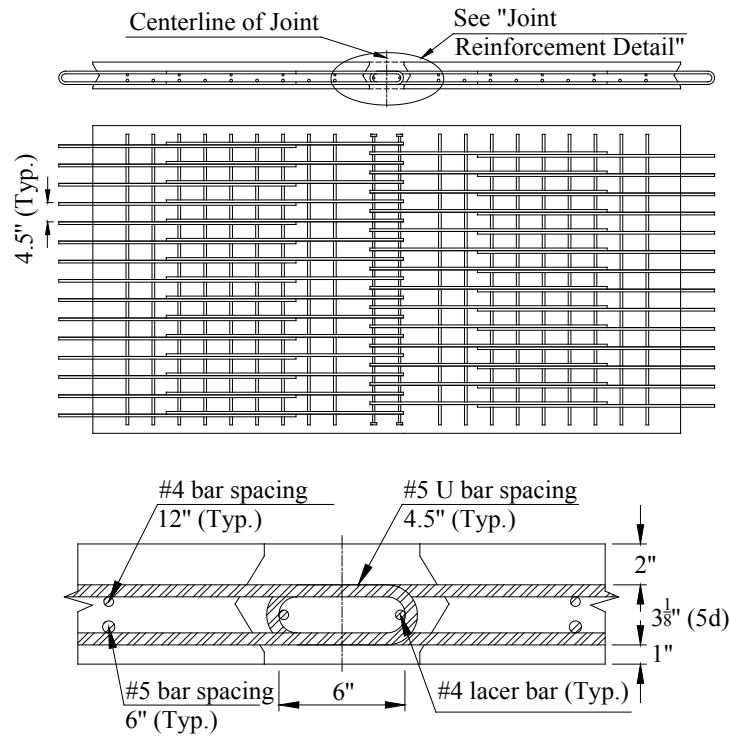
Reinforcement layout in longitudinal joint specimen
